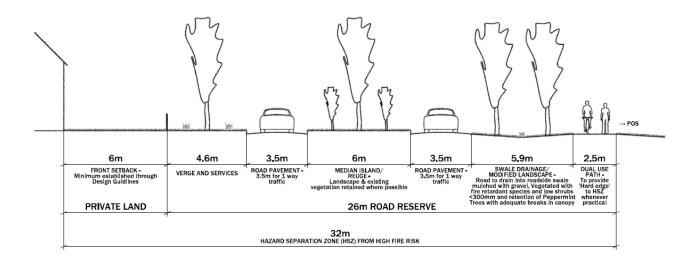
Indicative cross section of the access street at the eastern edge of the development footprint.
